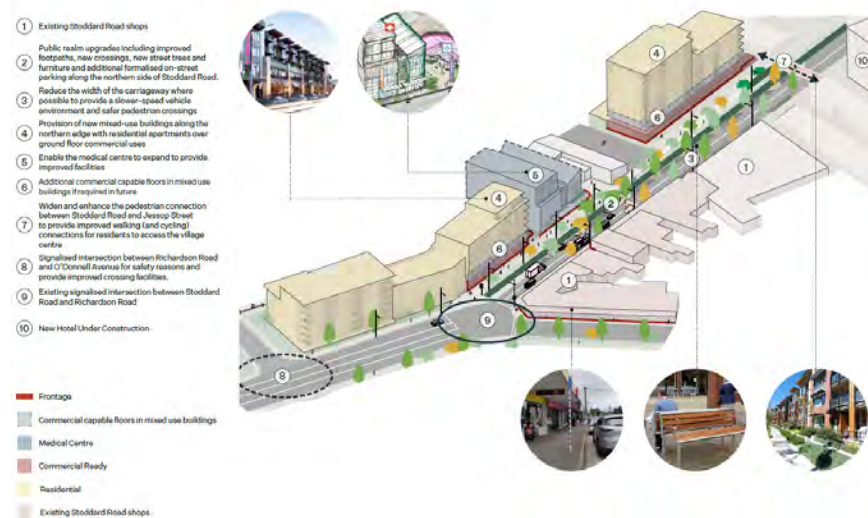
Wesley West Master Plan. Stoddard Road Village Centre
